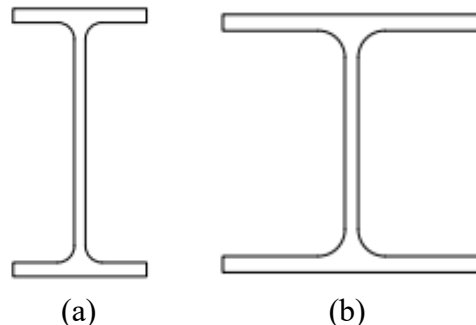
Cross-section profiles considered in this study: (a) I-cross-section; (b) H cross-section
